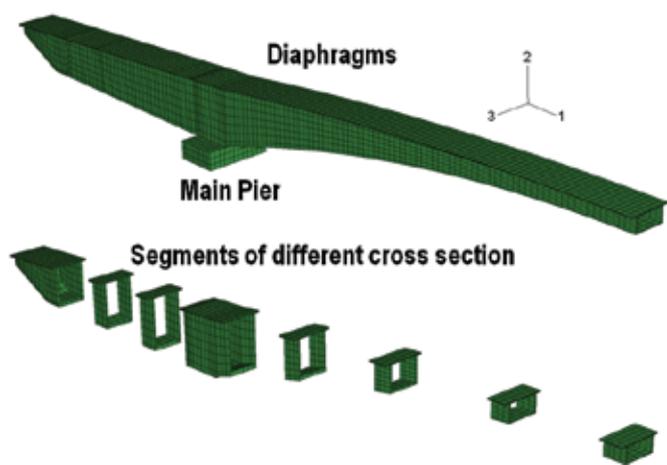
Model of KB Bridge built in ABAQUS showing diaphragms and segments of the box girders.
